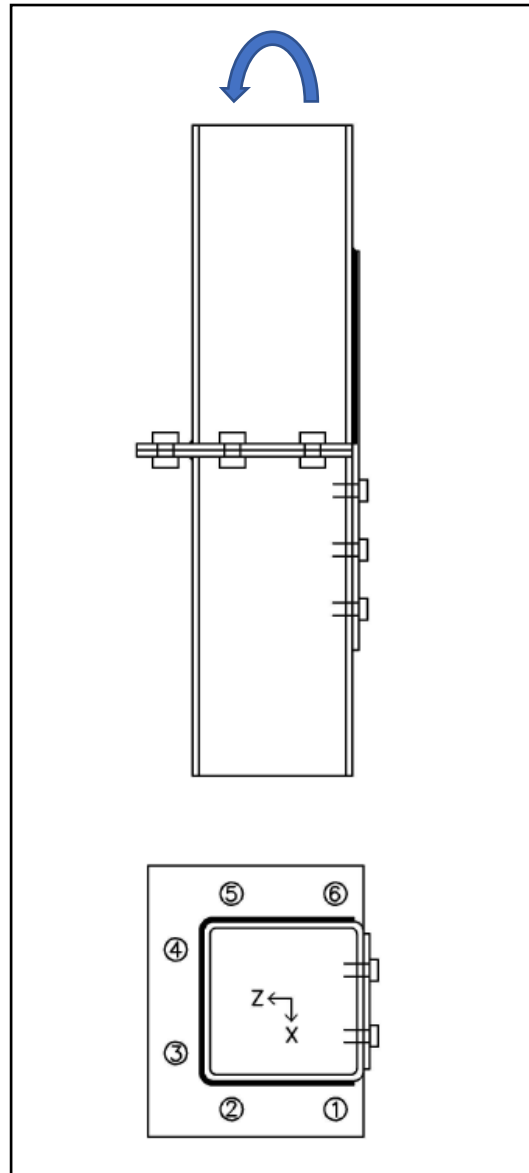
Plan and elevation of specimen IC-1 (case 2)
